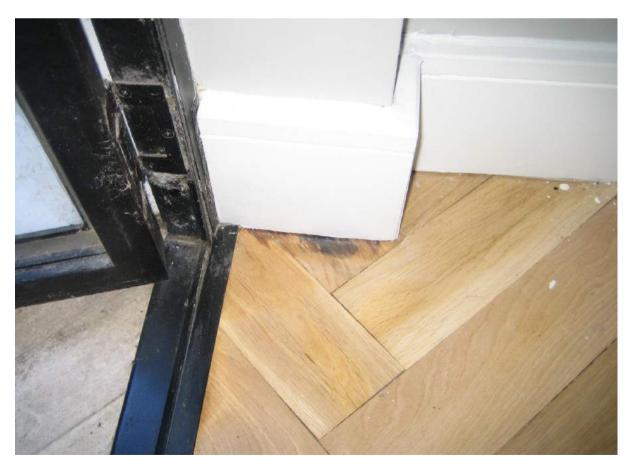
Water penetration and damage in N/W corner of bedroom 1 in Unit G01.
